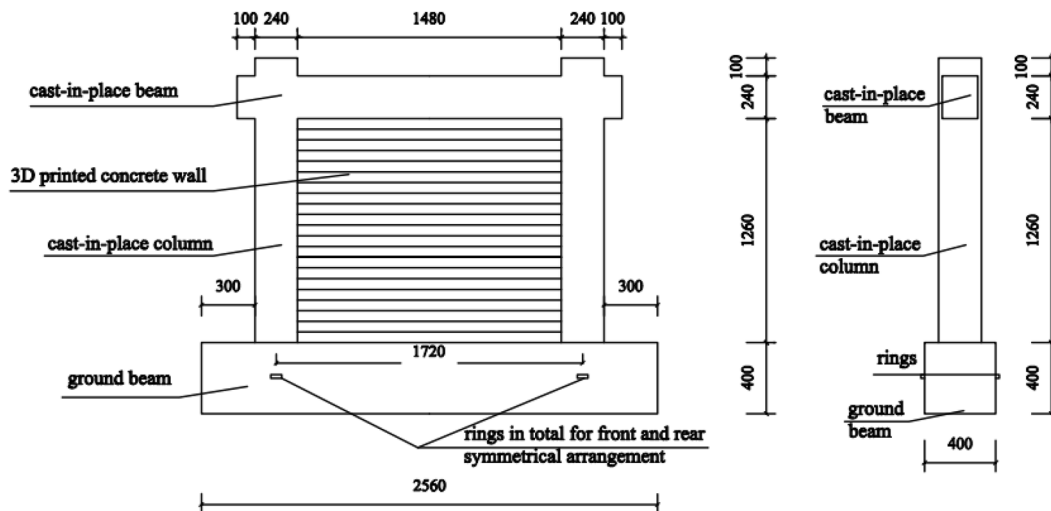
Dimensions of wall frame with hollow printing (mm)
